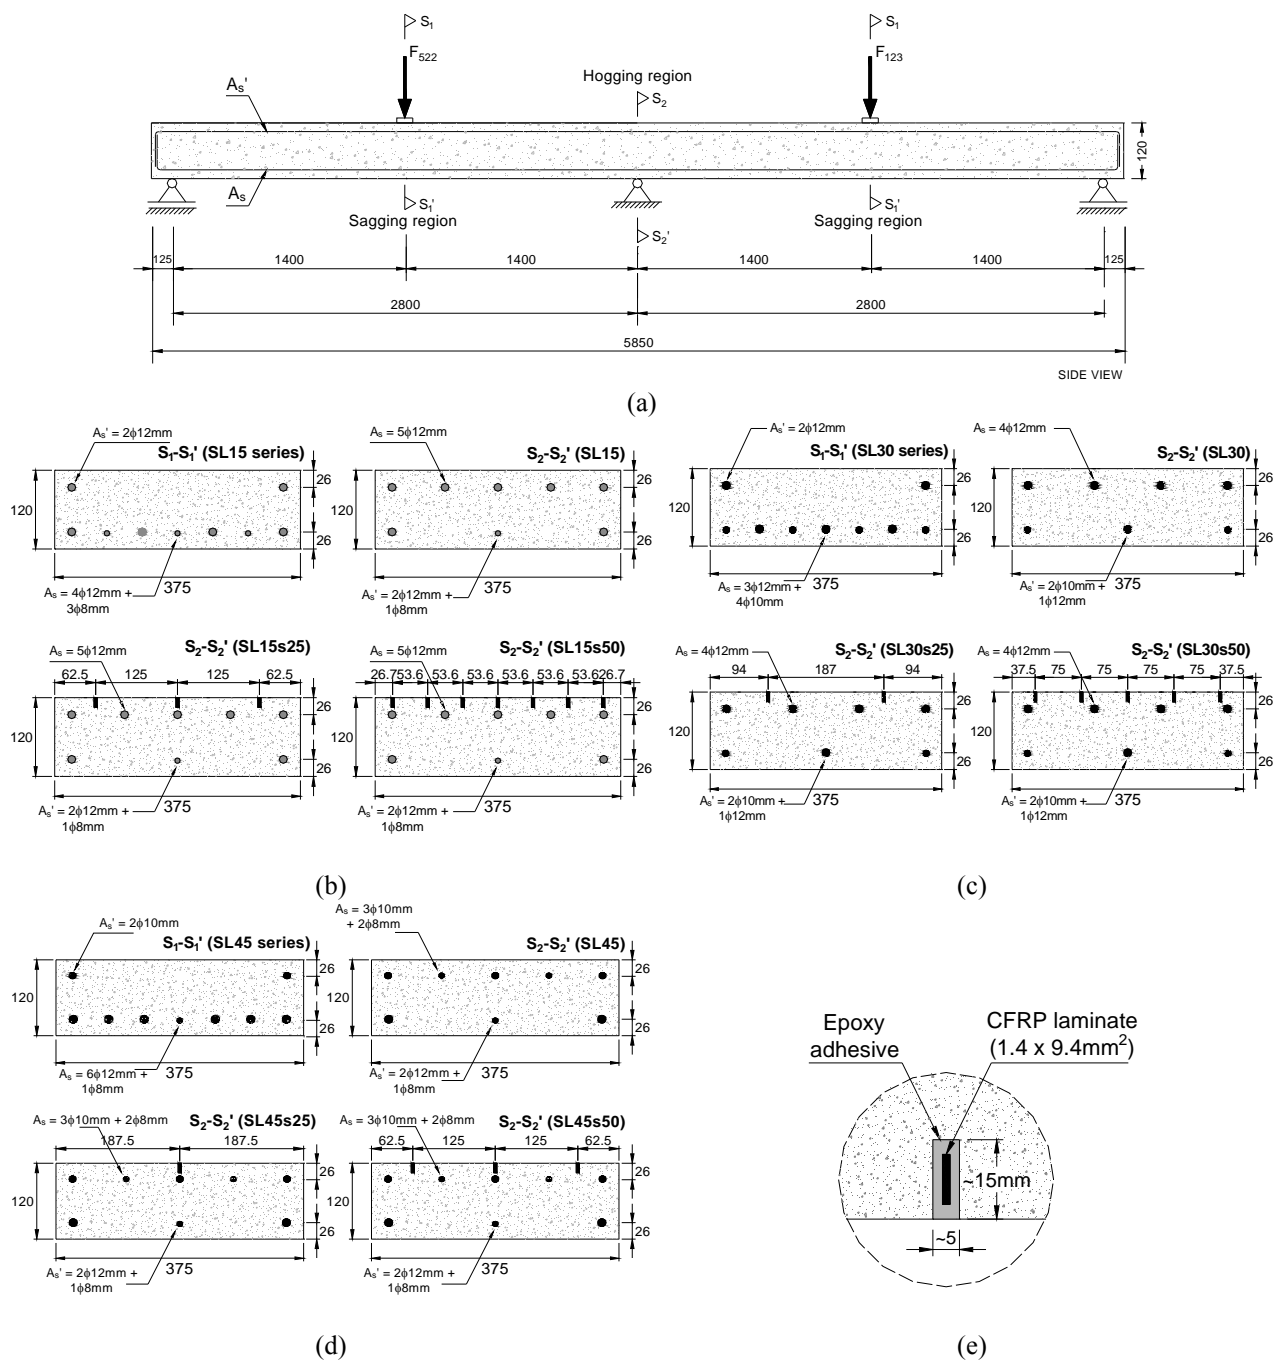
Characteristics of the slab specimens: (a) longitudinal view of the reinforcement arrangements; reinforcement and strengthening details of the (b) SL15, (c) SL30, and (d) SL45 series; (e) geometry of the slit and CFRP strip (A_s' - top reinforcement; A_s - bottom reinforcement; dimensions in mm).
